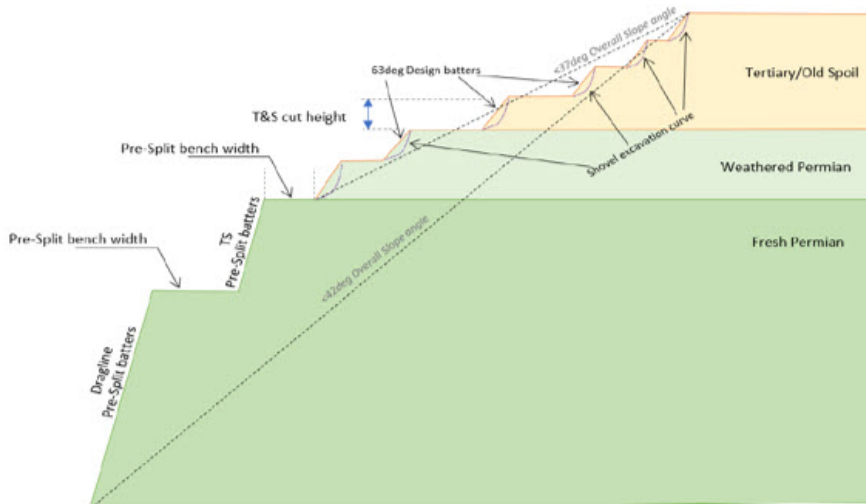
Typical Excavation Slope Design - Coppabella Mine
